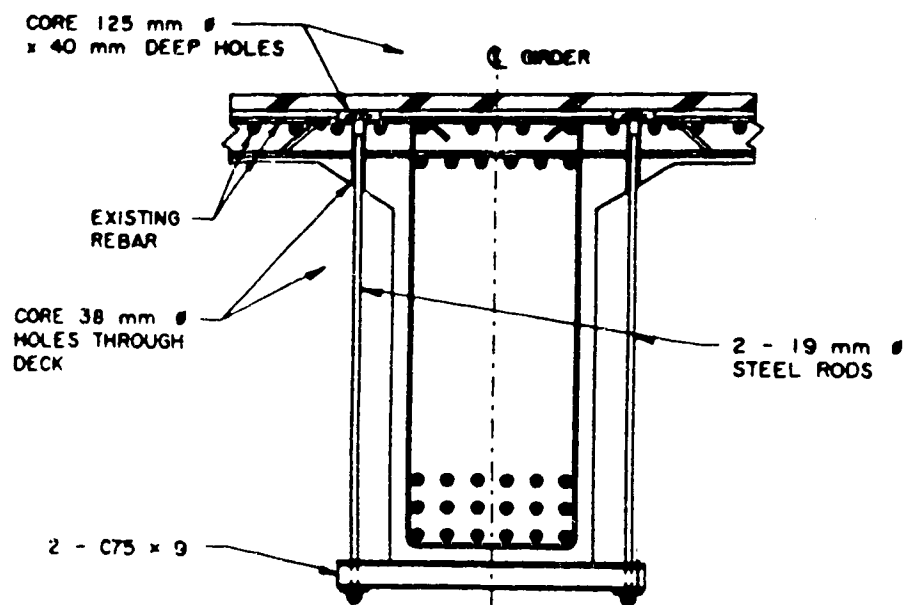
Shear strengthening of T-beam bridge using external steel stirrups
